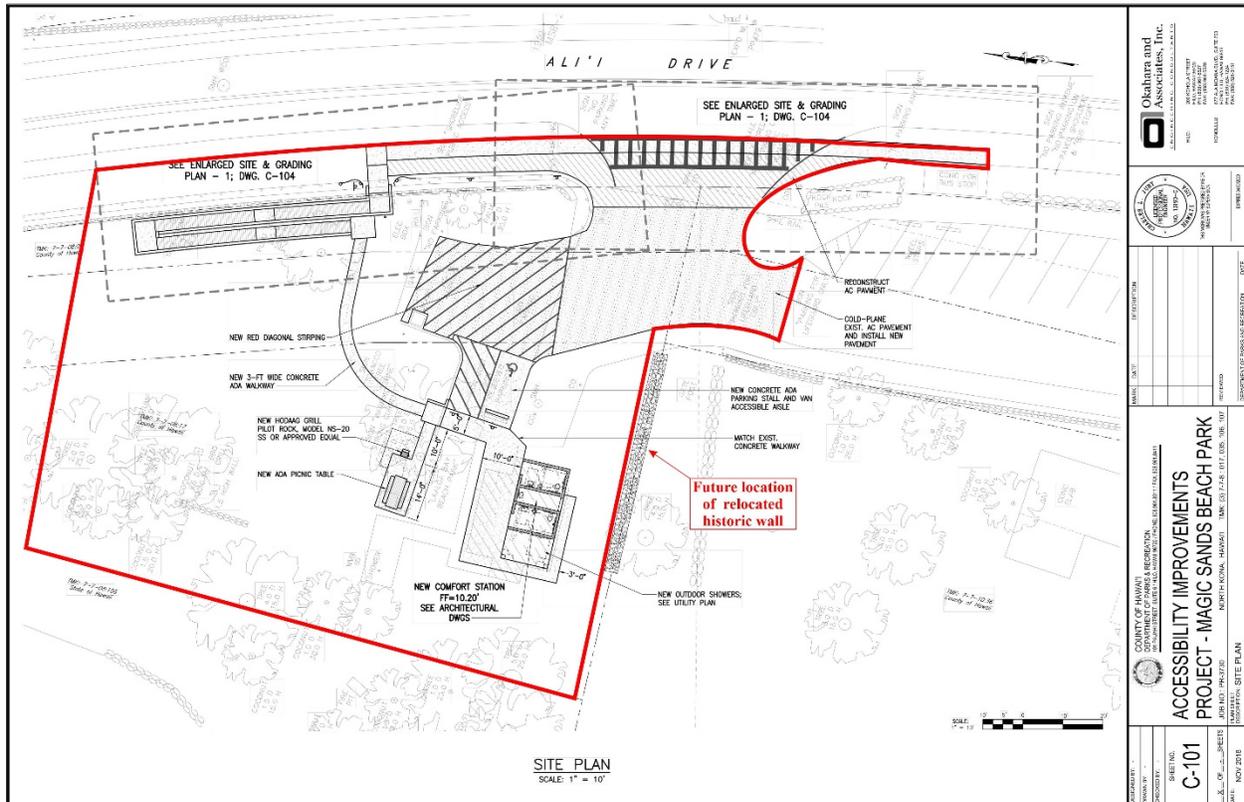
Proposed plans for the La‘aloa Beach Park accessibility improvements project.
